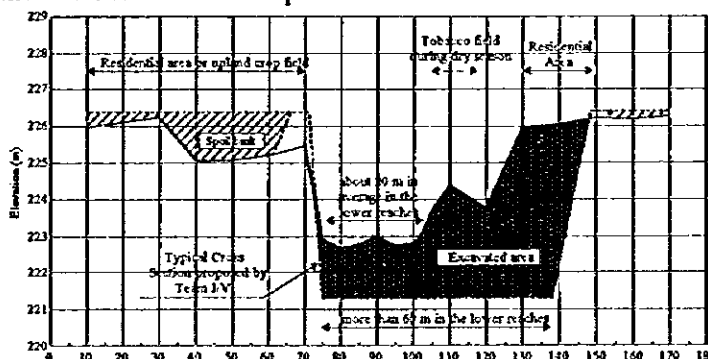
(8)-3 Typical Cross Section Proposed by Thai side study
